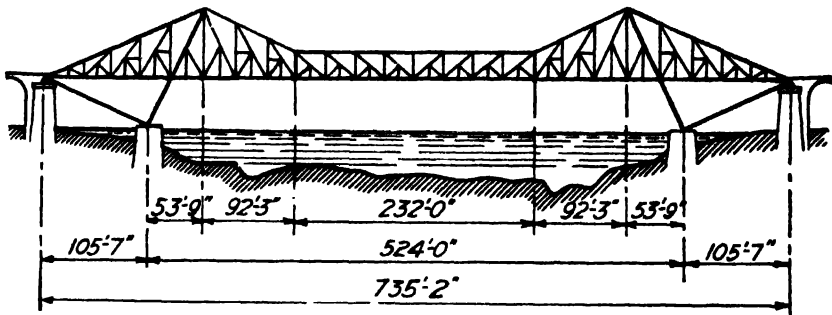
a. Connel's Ferry Bridge Carrying the Callender and Oban Railway across Loch Elvie, Scotland.
